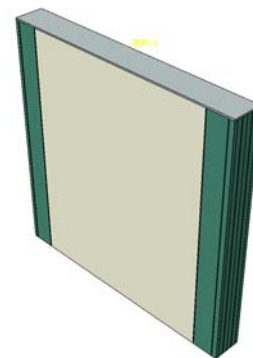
Modeling of Buried column in concrete shear wall with 1.67 ratio
